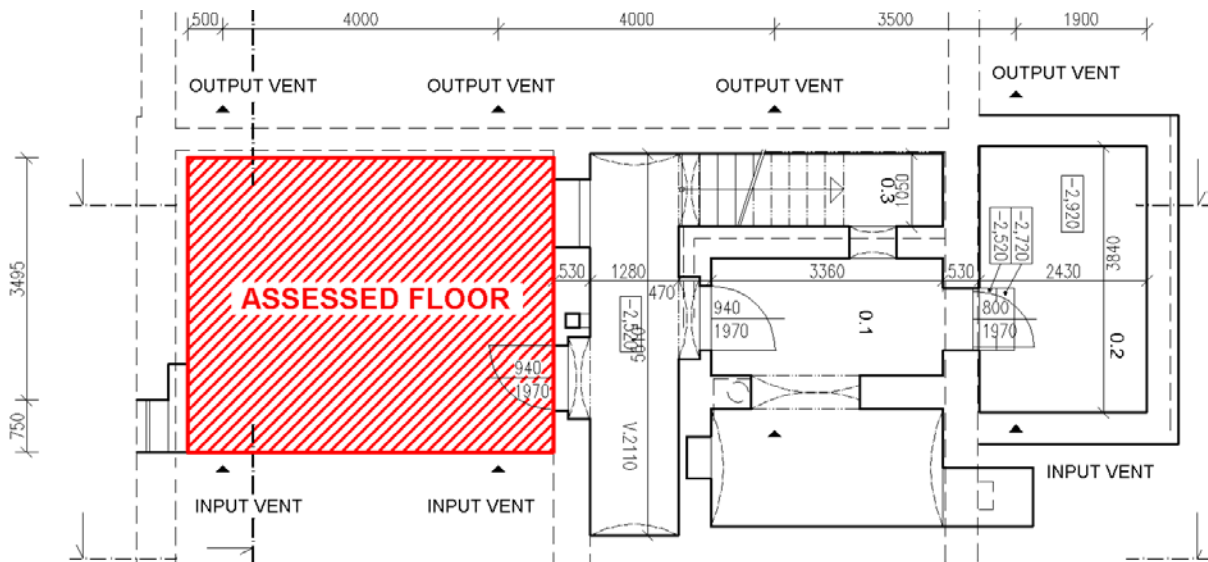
Reconstruction of residential house at Svatopluka Cecha street No. 12, Brno. [3]
